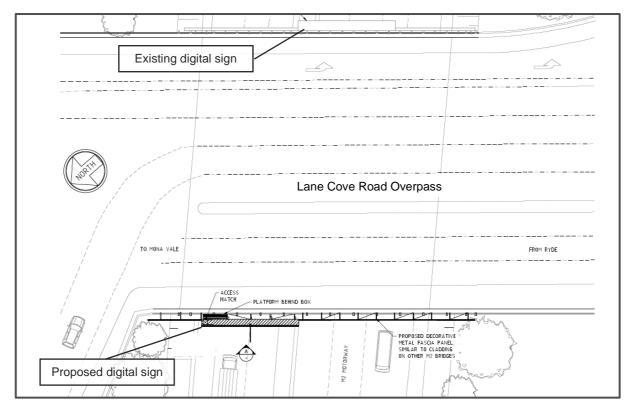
| Site Plan (source: Applicant's Engineering Plans)
